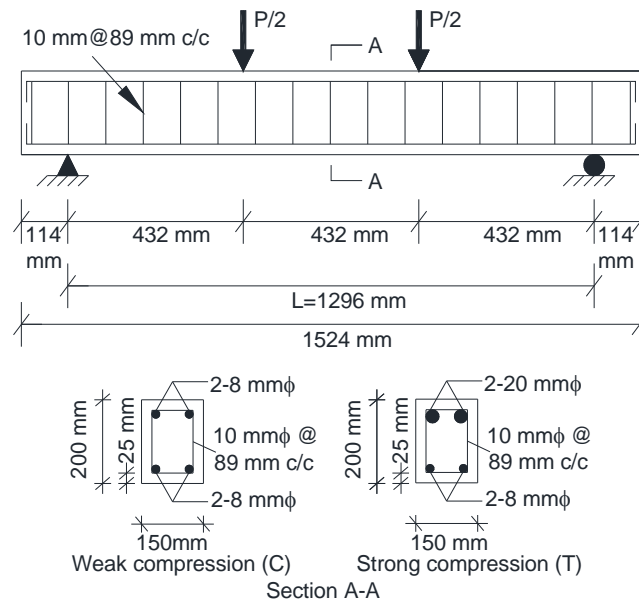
Typical beam specimens and their steel reinforcement schemes. The reinforcements for weak-compression-zone (C) and strong-compression-zone (T) specimens are shown in Section A-A. This figure should be read in conjunction with Figure 3.
